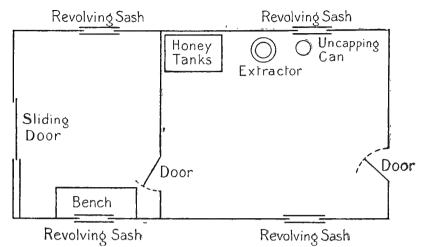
Floor-plan of Extracting-house built on the Flat.
